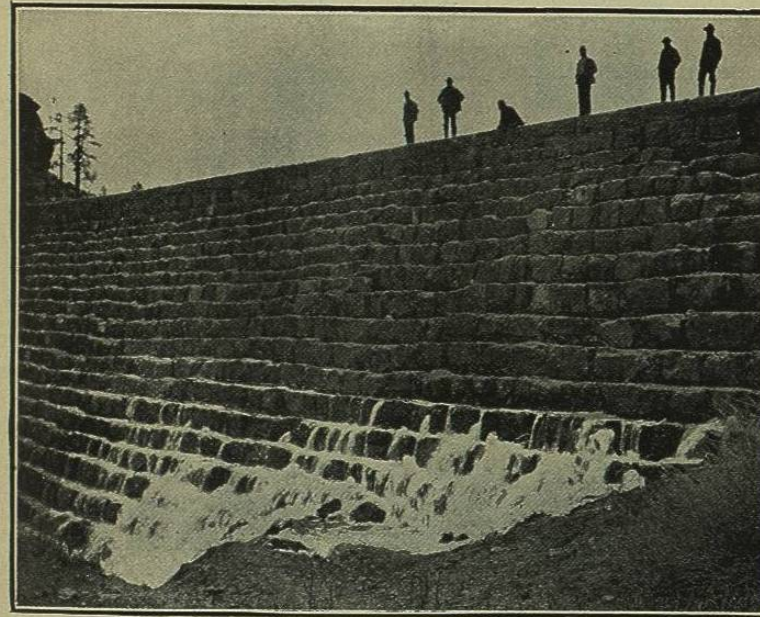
CASTLEWOOD DAM, COLO., SHOWING LEAKAGE THROUGH ROCK-FILL.
